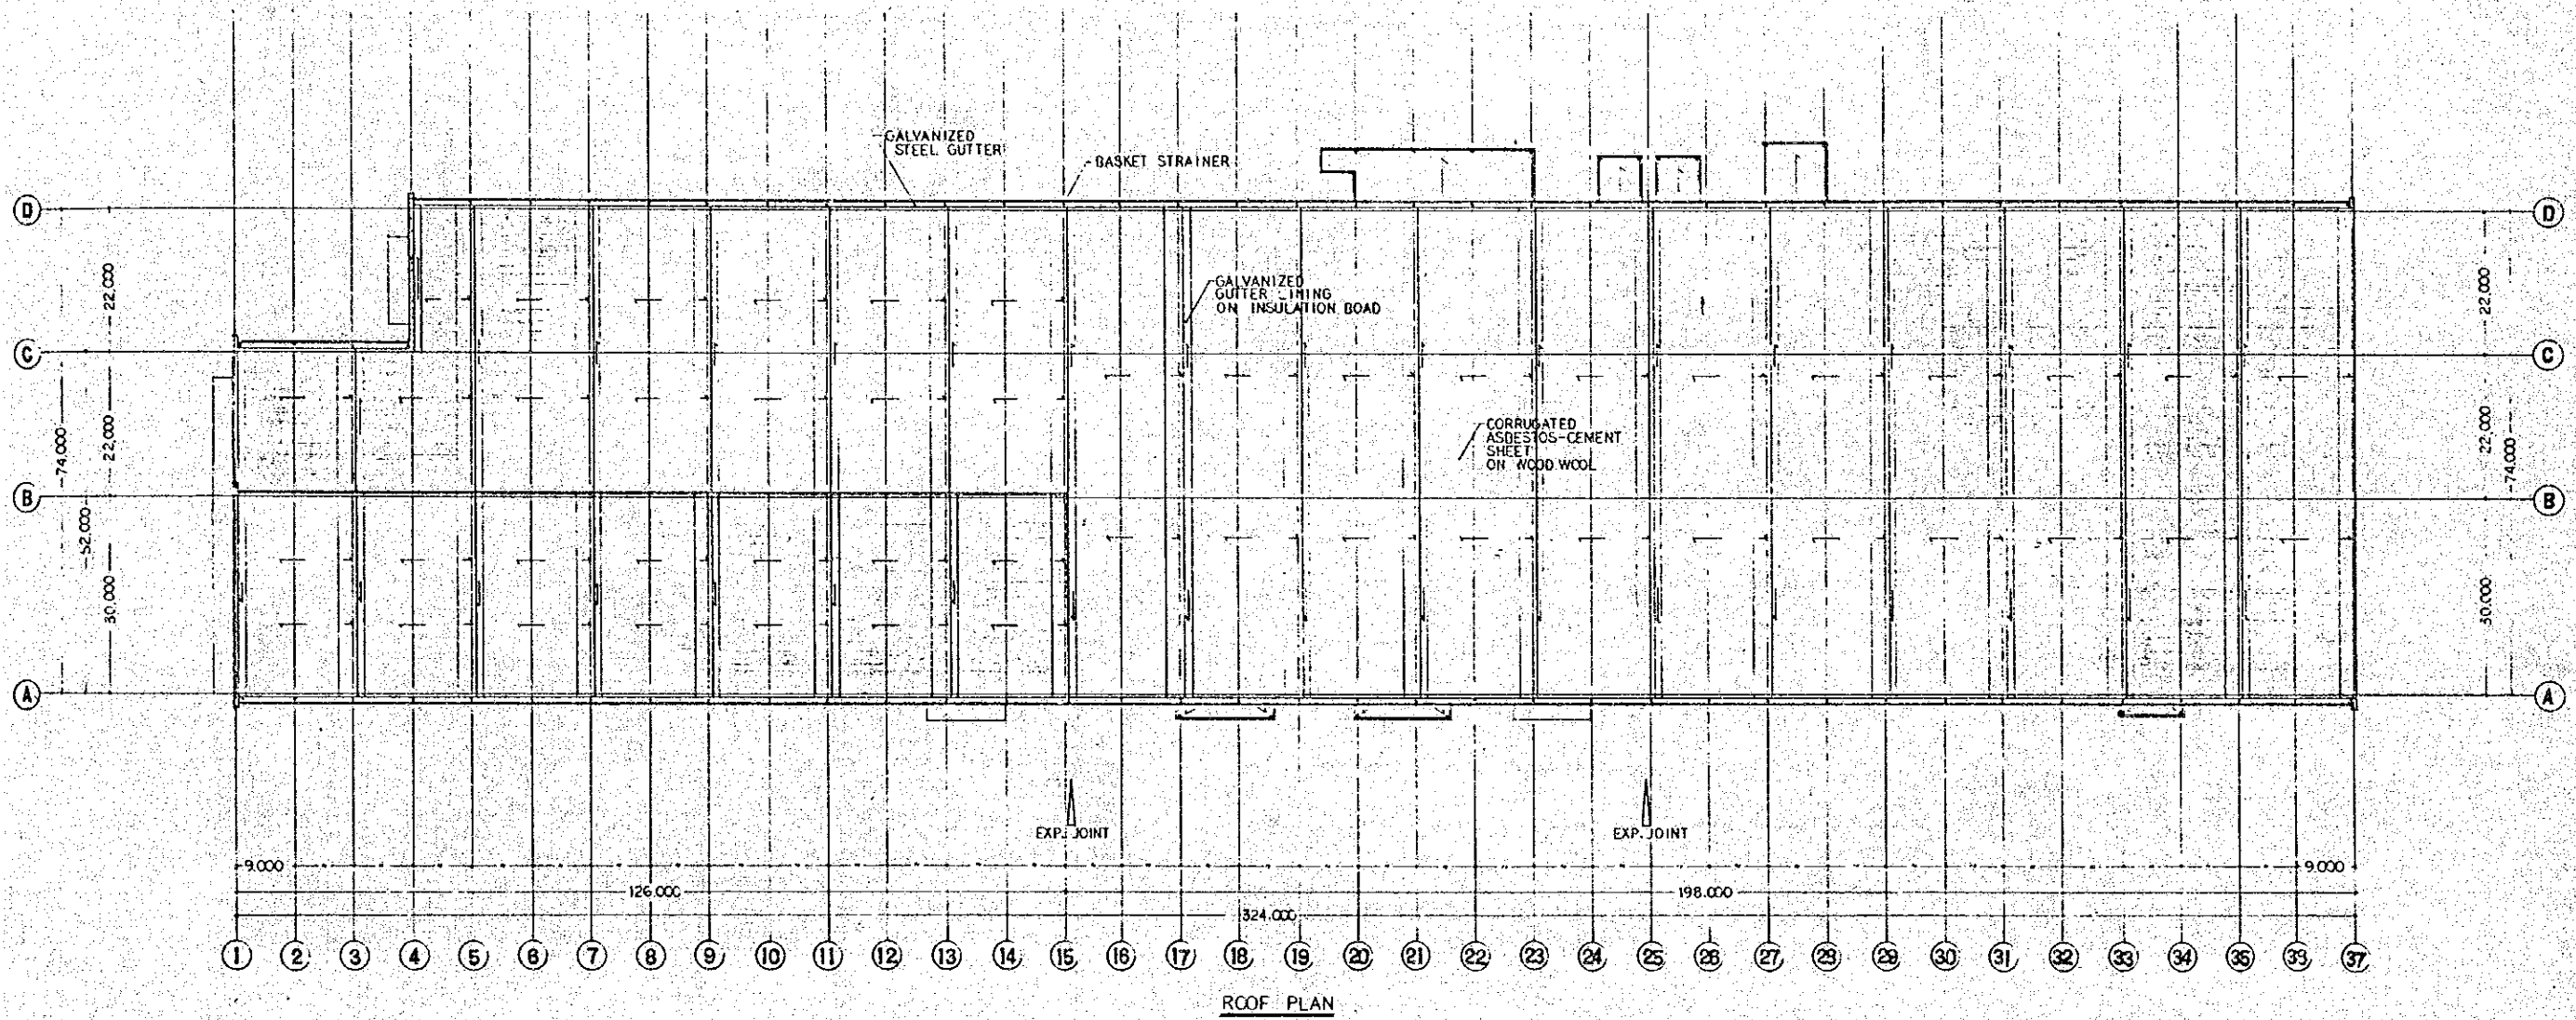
MAIN WORKSHOP BUILDING
